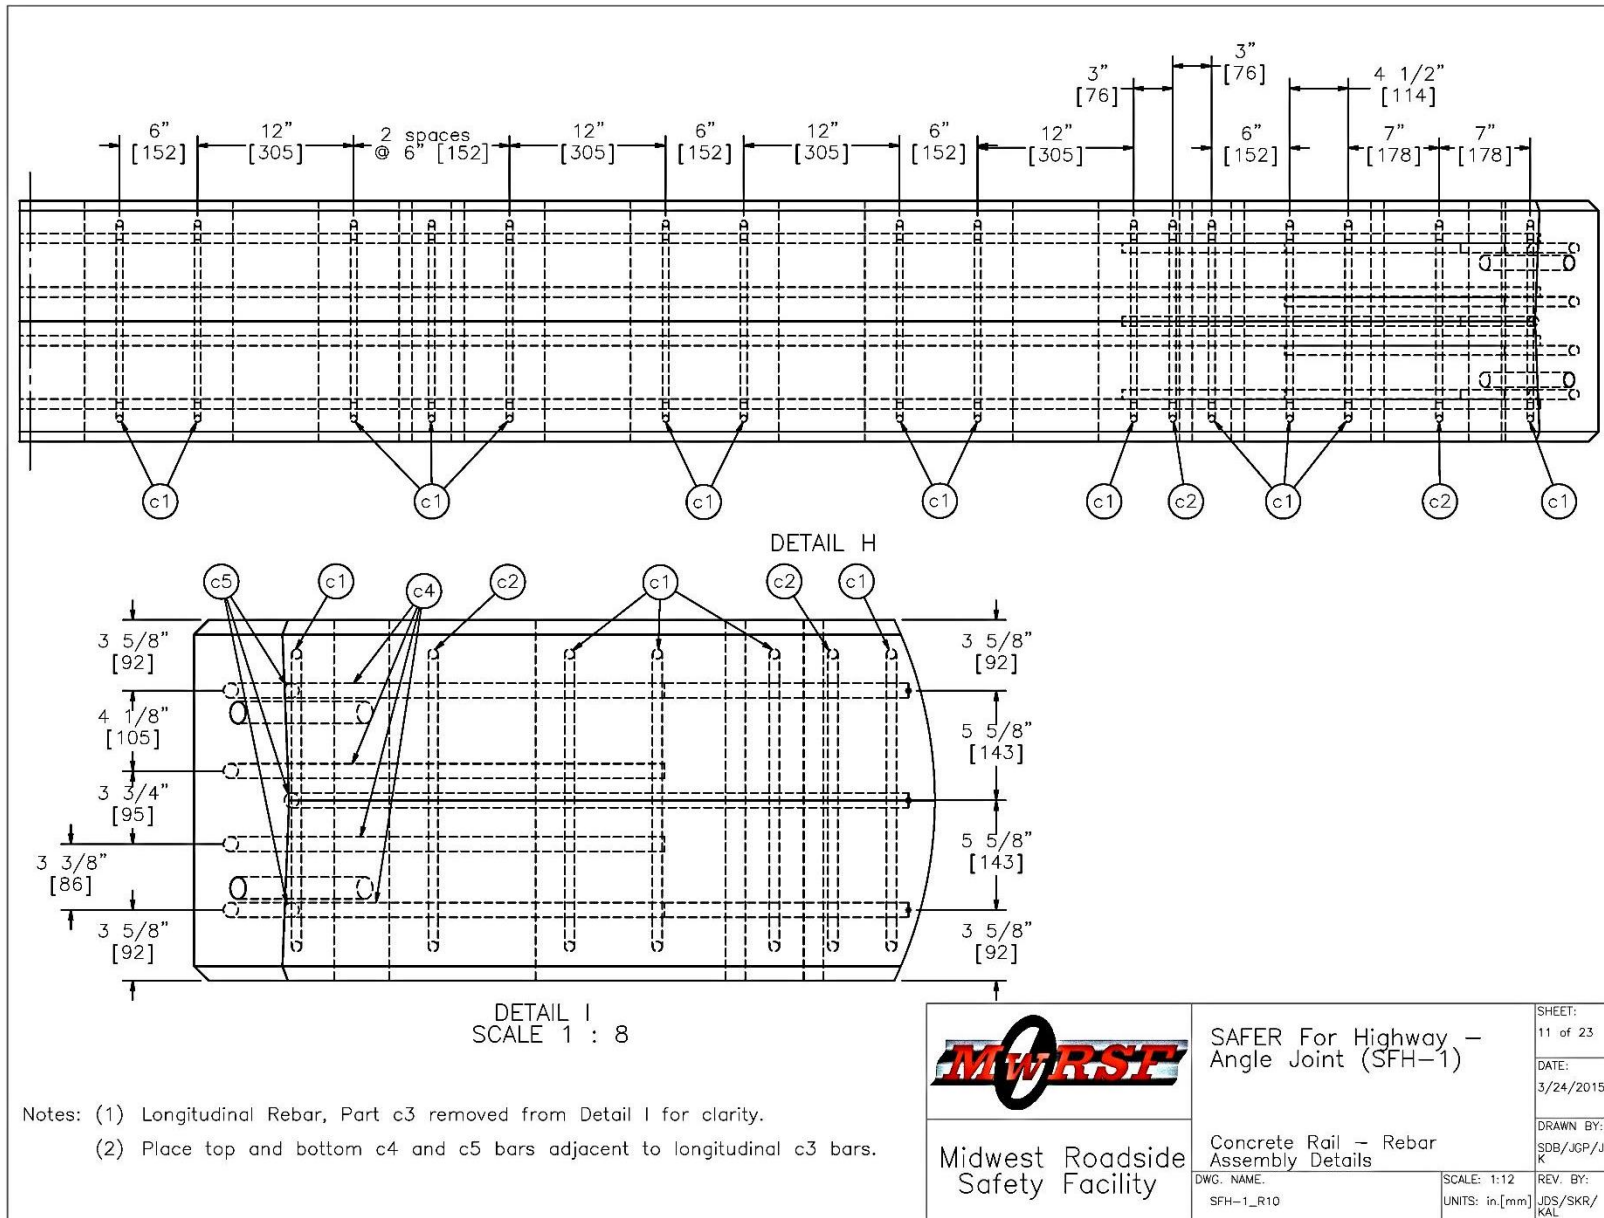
Concrete Beam, Rebar Assembly Details, Test Nos. SFH-1 and SFH-2
